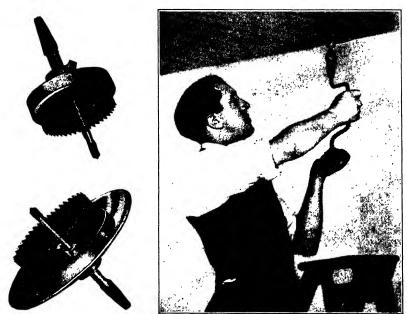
(Left) Rotary and Ceiling Hack Saw; (Right) Method of Cutting a Circular Opening
